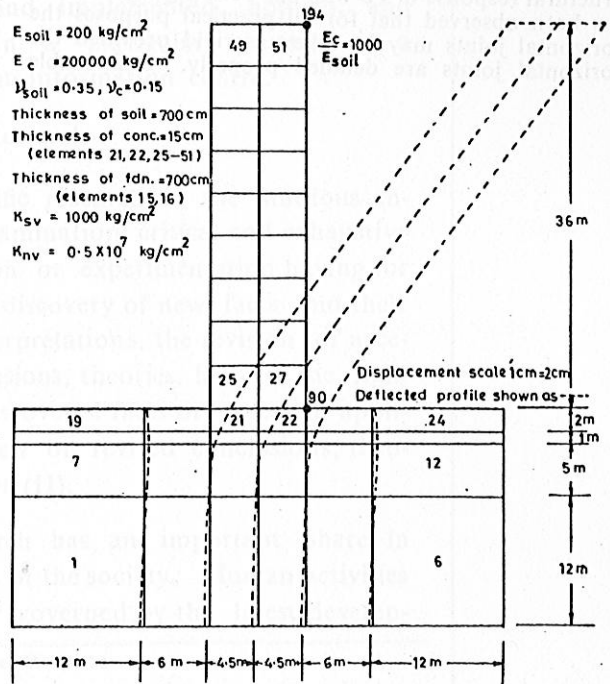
36 m high PS wall with soil foundation system discretization and deflected profile
